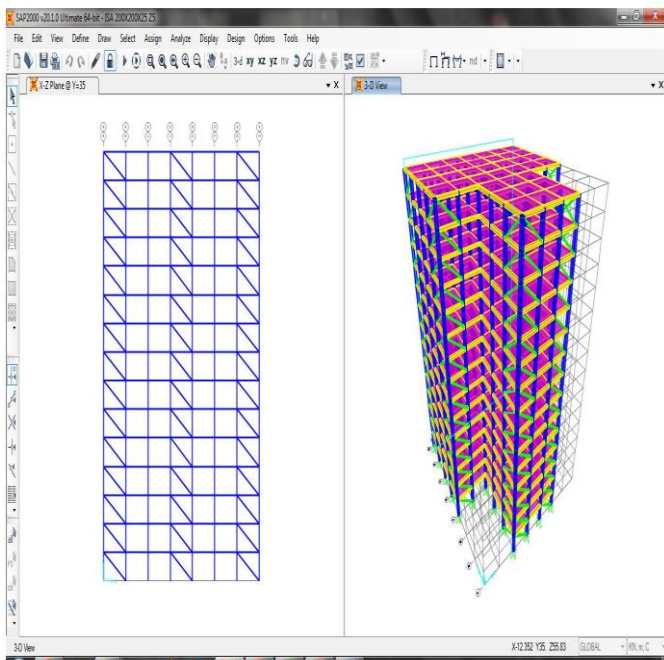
Elevation and 3D view of building with Single Diagonal bracing
